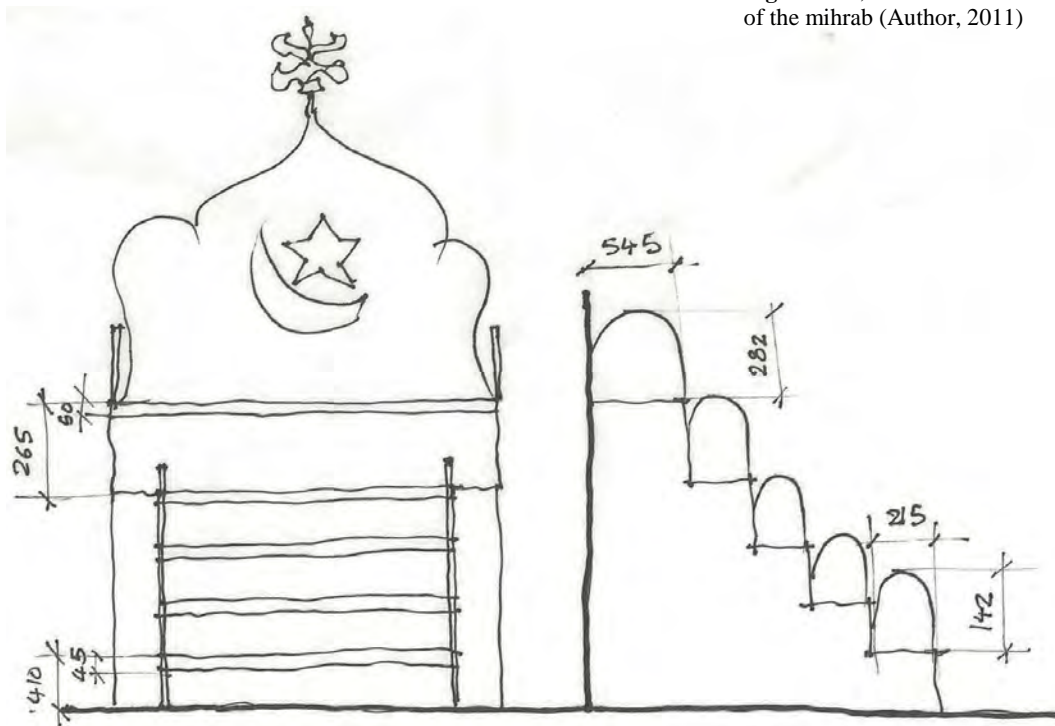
, Front and side elevation of the mimbar (Author, 2011)
